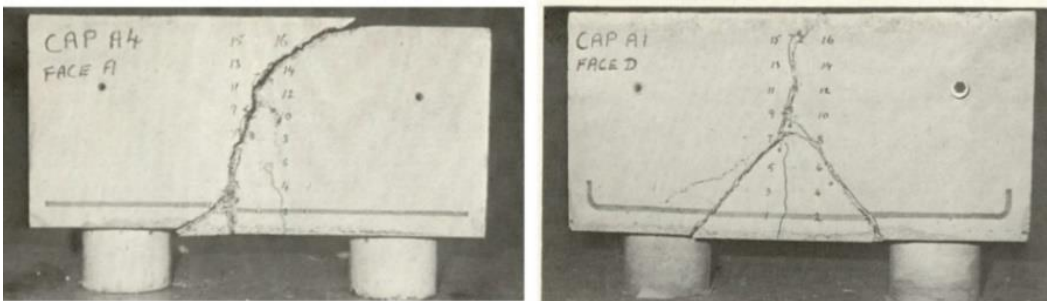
Beam-type shear failure (left) and punching shear failure (right) (Clarke, 1973)
